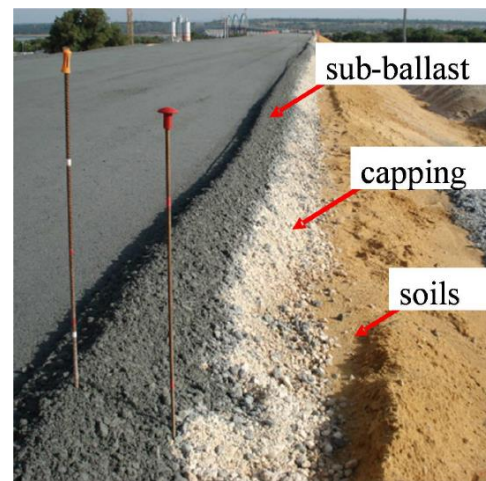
Substructure of a ballasted track (Paixão, 2014)
